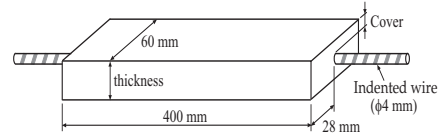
Geometry and dimensions of the specimens form Galvez et al. 2009.
